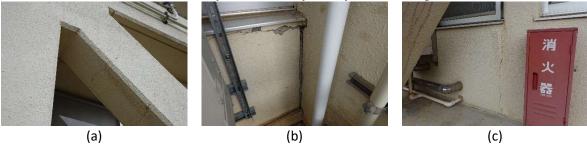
Observed damages in retrofitted frame: (a) Minor tension cracking in RC braces, (b)(c) cracking and spalling at the seismic slit next to the column
